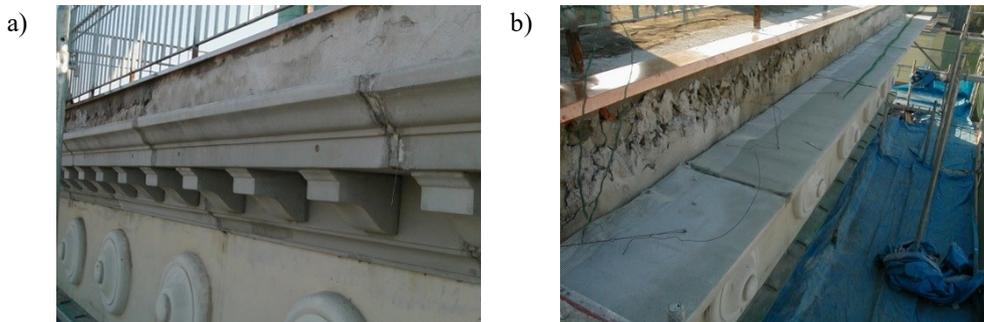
New cornice of the observation tower, a) bottom view with visible holes for mechanical connectors, b) top view with flashing of the tower ceiling.
